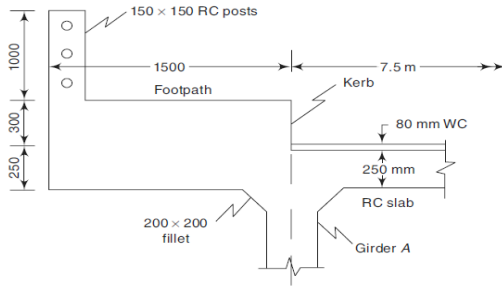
Details of footpath, kerb, parapet and keck slab
